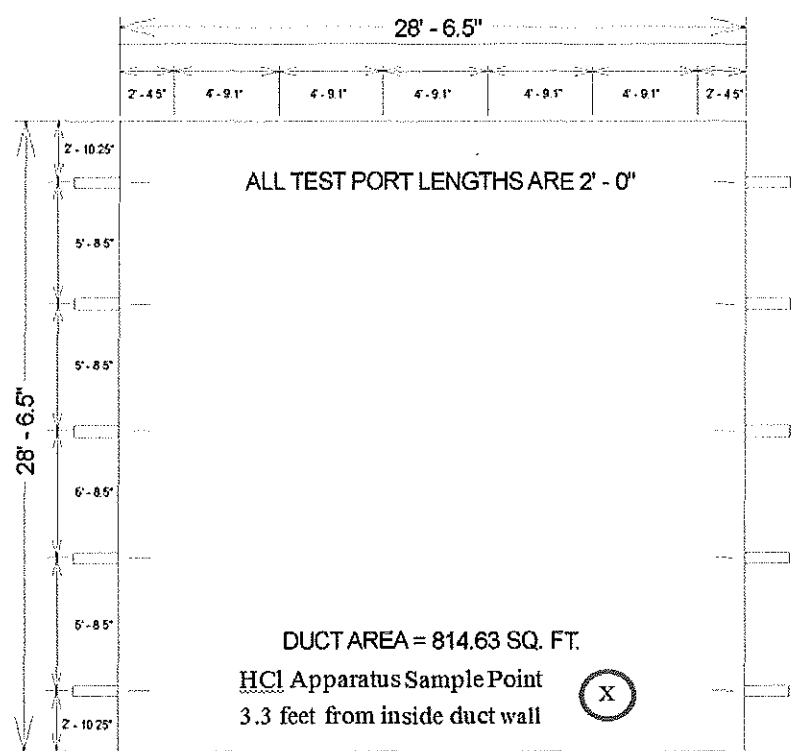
Unit 3 Outlet Duct Test Port Detail
